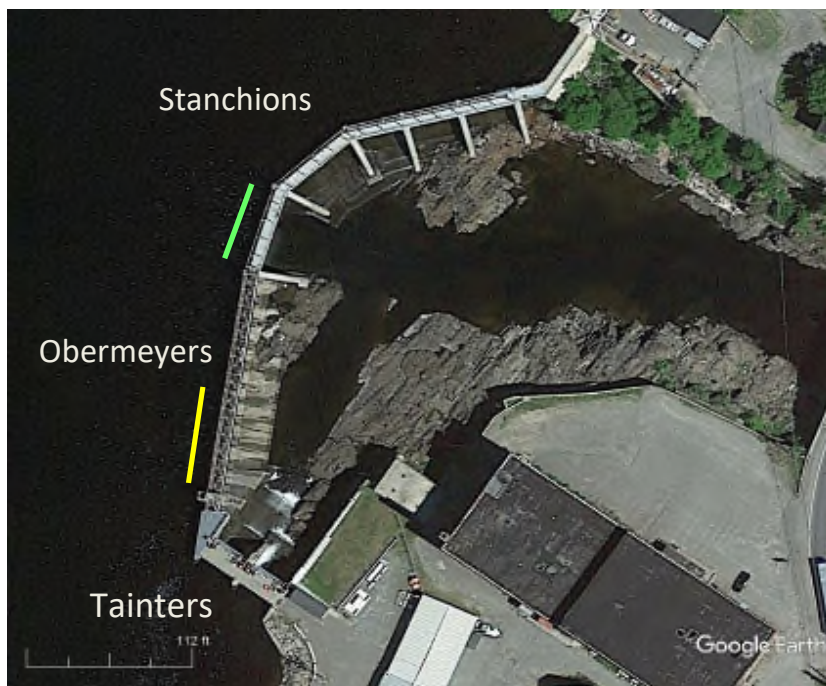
South Dam, powerhouse, downstream sluice and stanchions.
